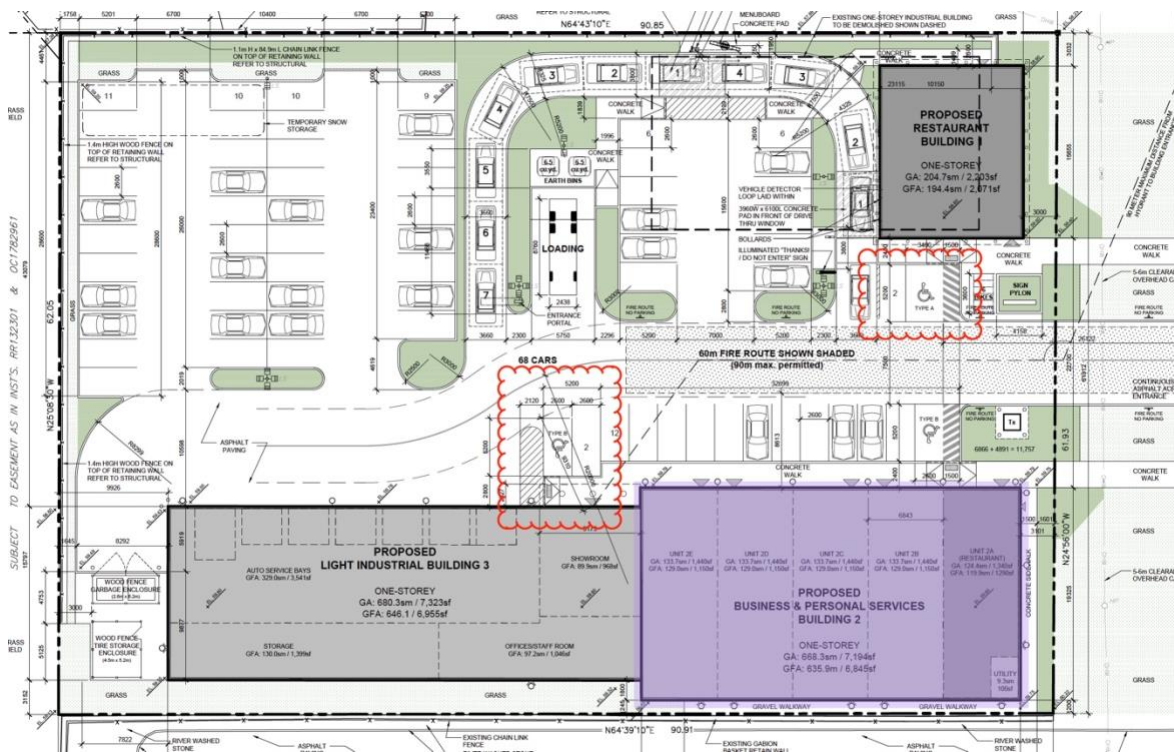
Figure showing Building 2, subject to expanded retail store use.
